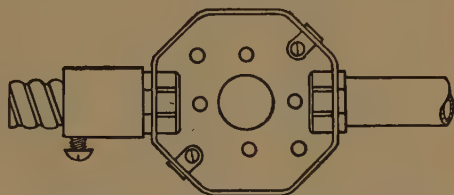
A sketch showing the manner in which rigid and flexible conduit are connected to outlet boxes.
